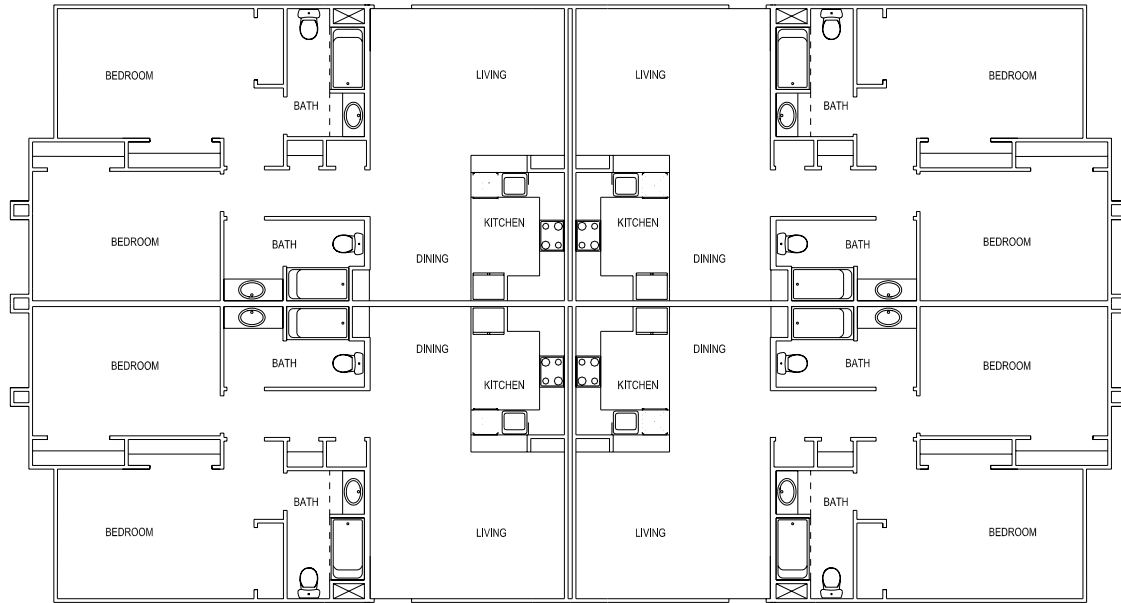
House #5 – Condominium Floor Plan (four units shown)
